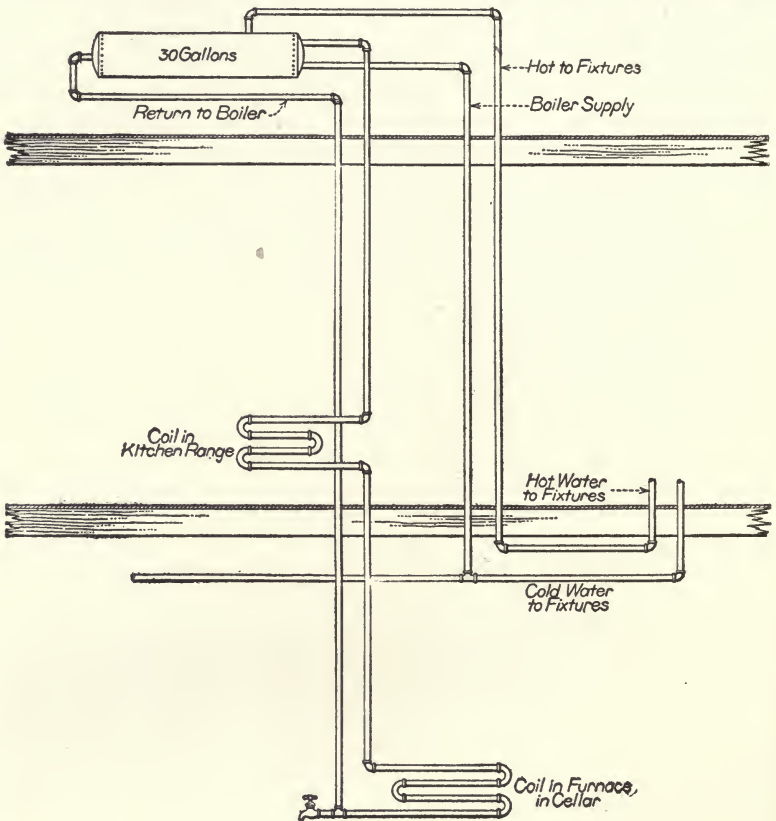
Connections to a Horizontal Boiler Which Caused Short Circuiting.
